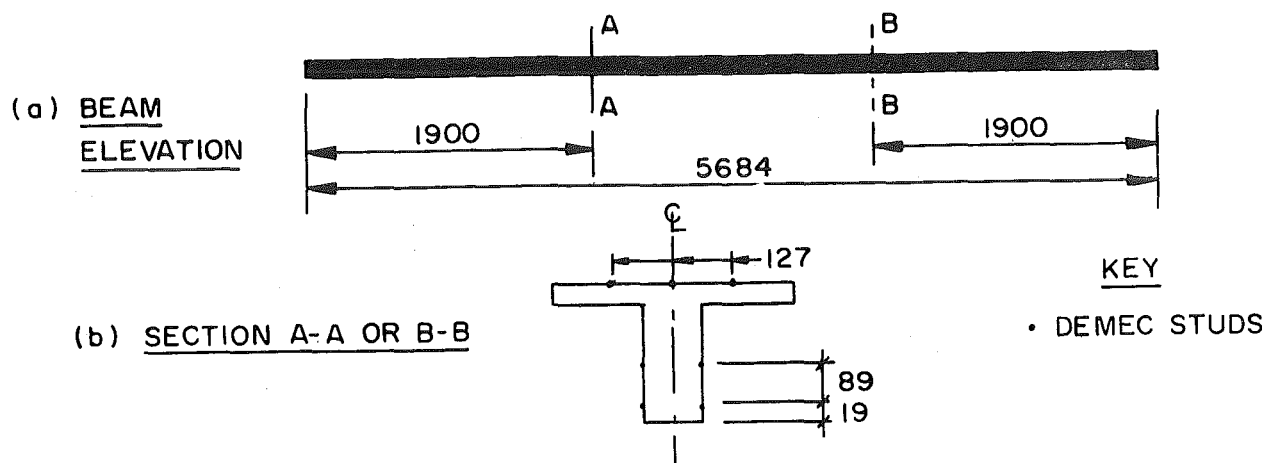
BEAM ONE SHRINKAGE GAUGE LOCATIONS
